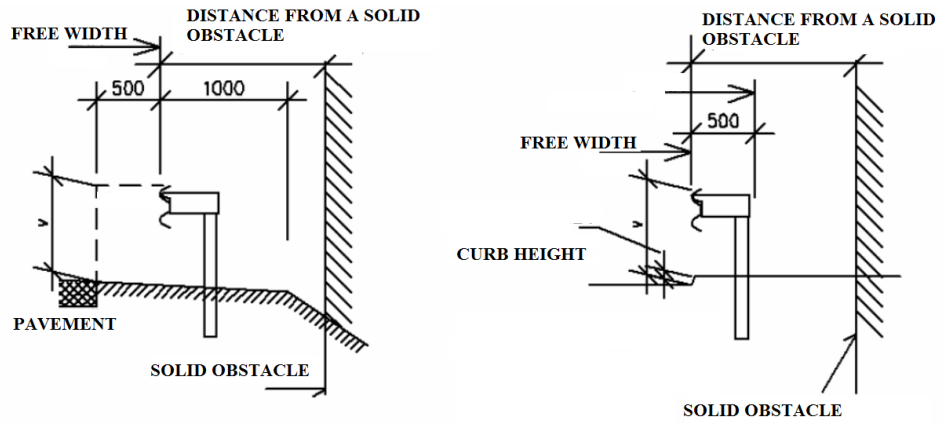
Single-sided crash barrier placement on a roadside [54]
